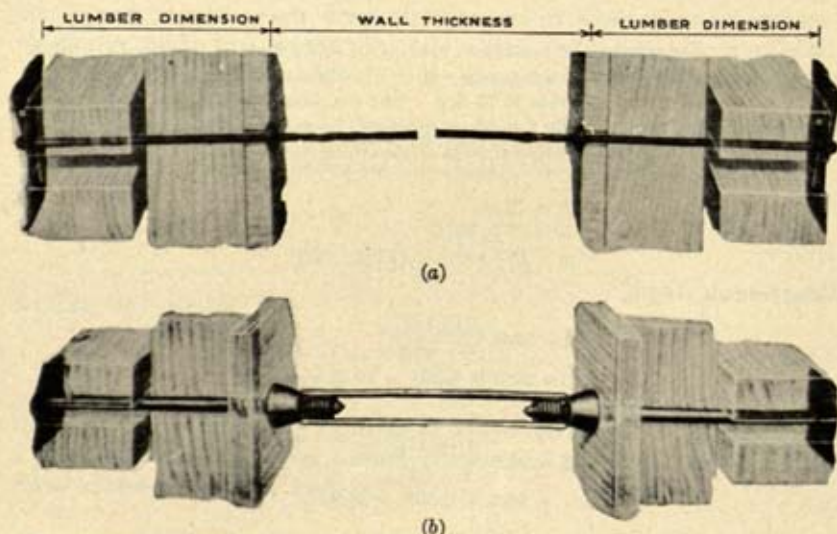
Form ties for concrete walls: (a) snap tie; (b) coil tie. (Superior Concrete Accessories, Inc.)
